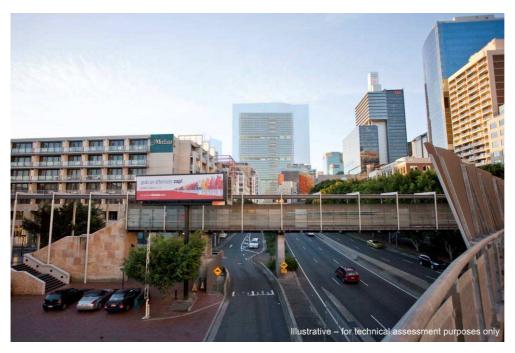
Shelley Street view corridor (from King Street Bridge) - Concept Plan Modification 4
